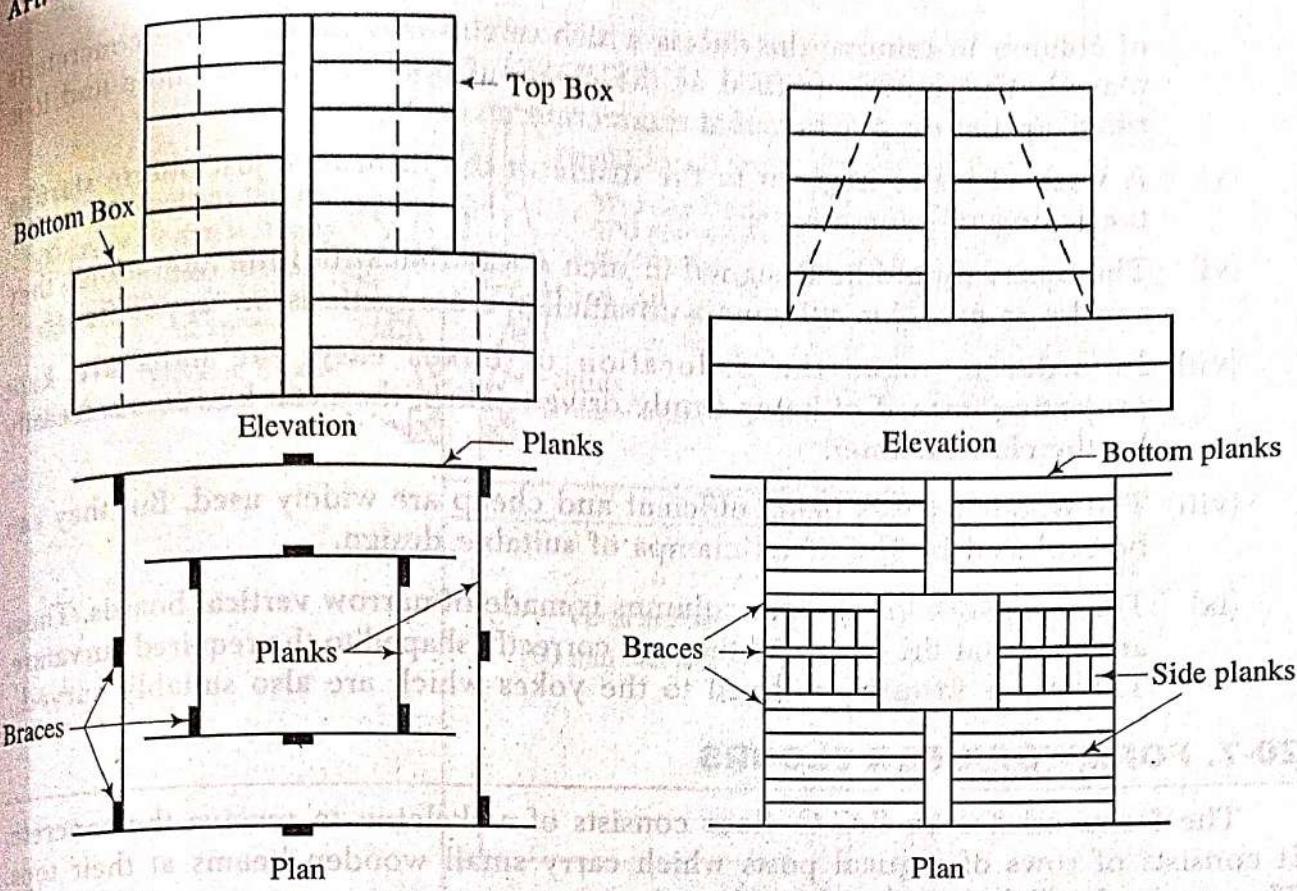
shows a column footing with steps. It is just similar to above. The bottom box is filled with concrete and after a short time, the top box is placed on the surface of the wet concrete.
